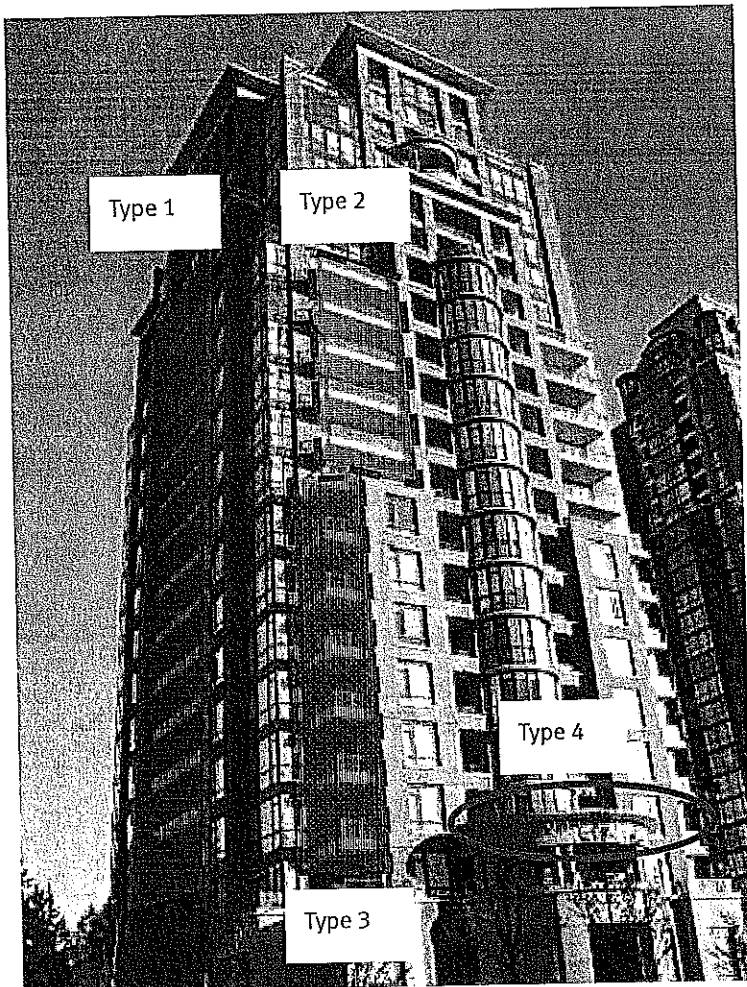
Southeast Elevation View of Balcony Layout.
